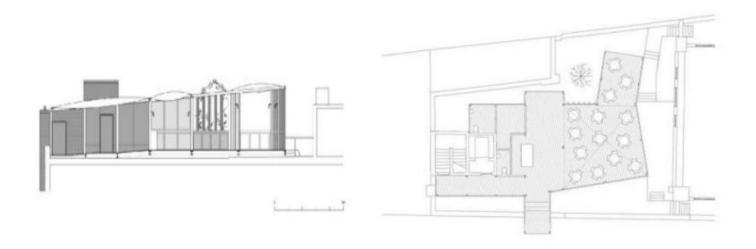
Left: Section view Right Floor plan (Source: architecturefoundation.org.uk)
